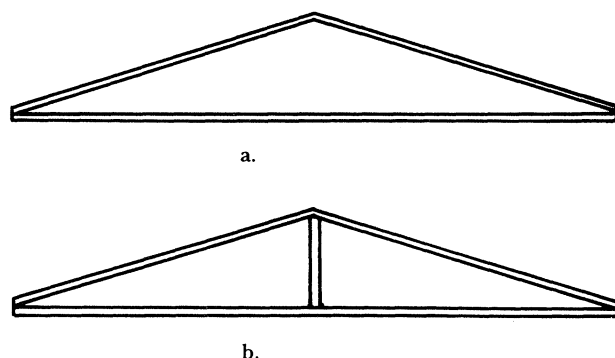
(a) Tie-beam truss; (b) tie-beam truss with king post
